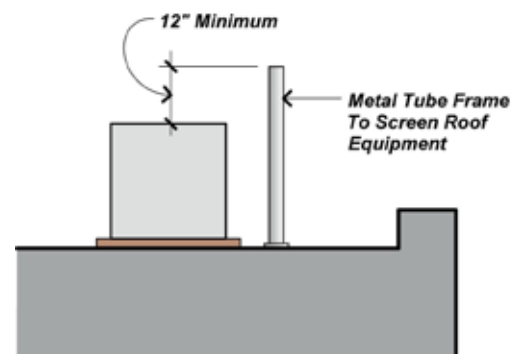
Example of non-compliant roof mounted equipment screen.
